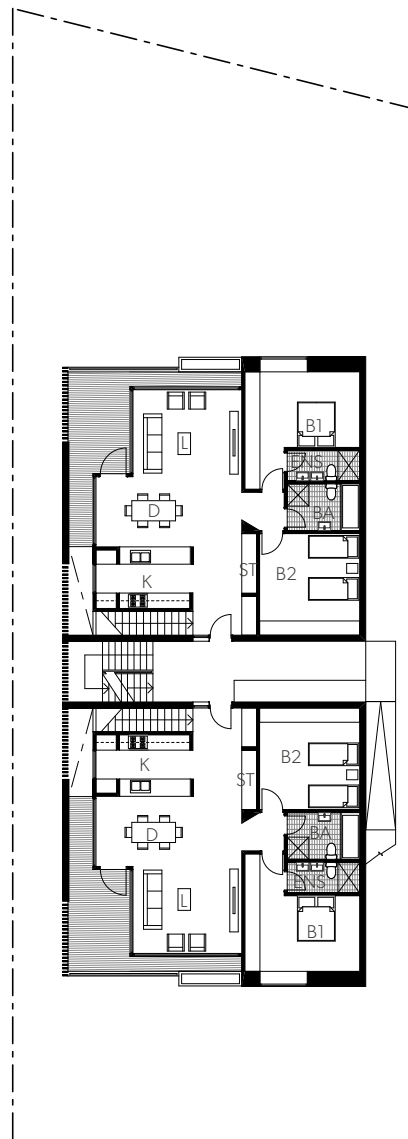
Sample plan of manor house with four dwellings on corner site
